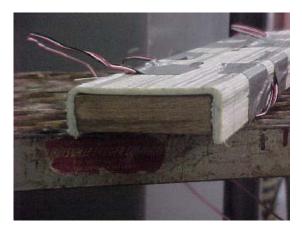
Wooden Stiffeners at Ends of Channel Section
